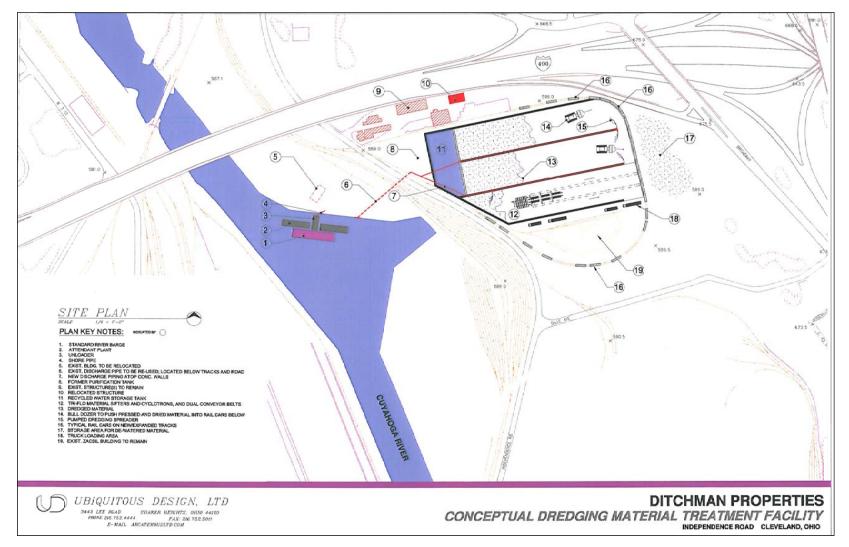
Conceptual design of offloading, dewatering, and re-handling facility for dredged material at the Zaclon site.
